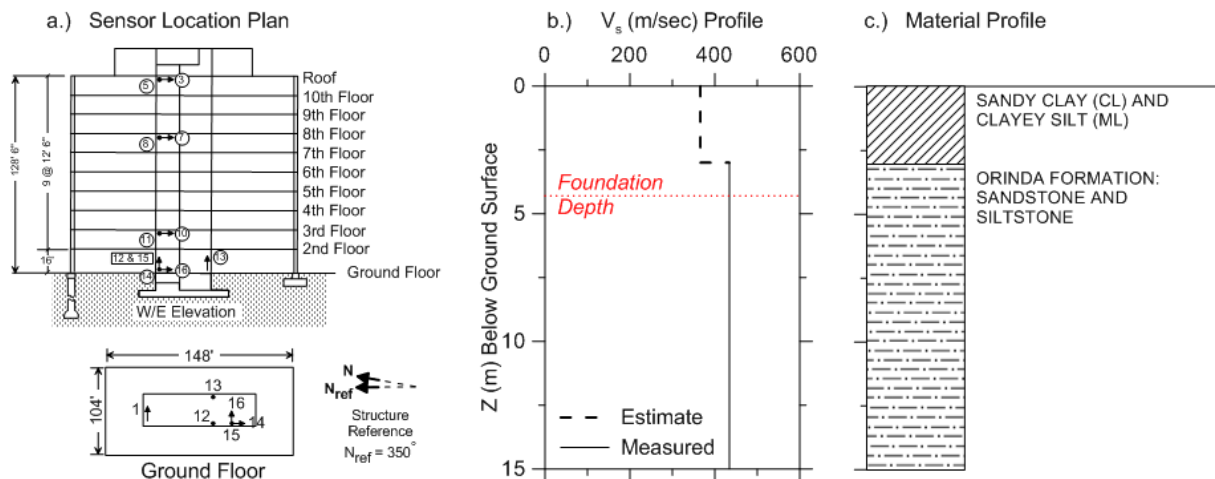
Illustration of Walnut Creek building and site characteristics; a) foundation and east-west oriented building sensor location map, b) soil shear-wave velocity profile, and c) soil material profile description.
